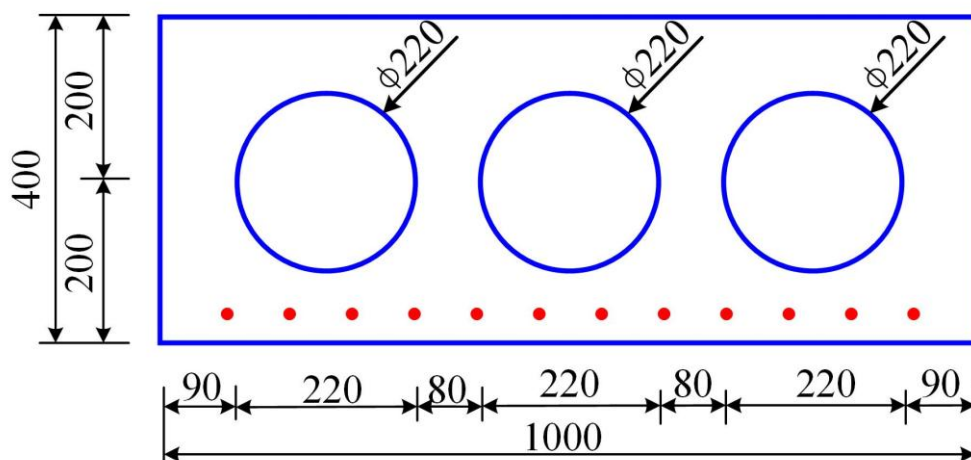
Cross-sectional Schematic of the 8 m Hollow Slab Beam (mm)
